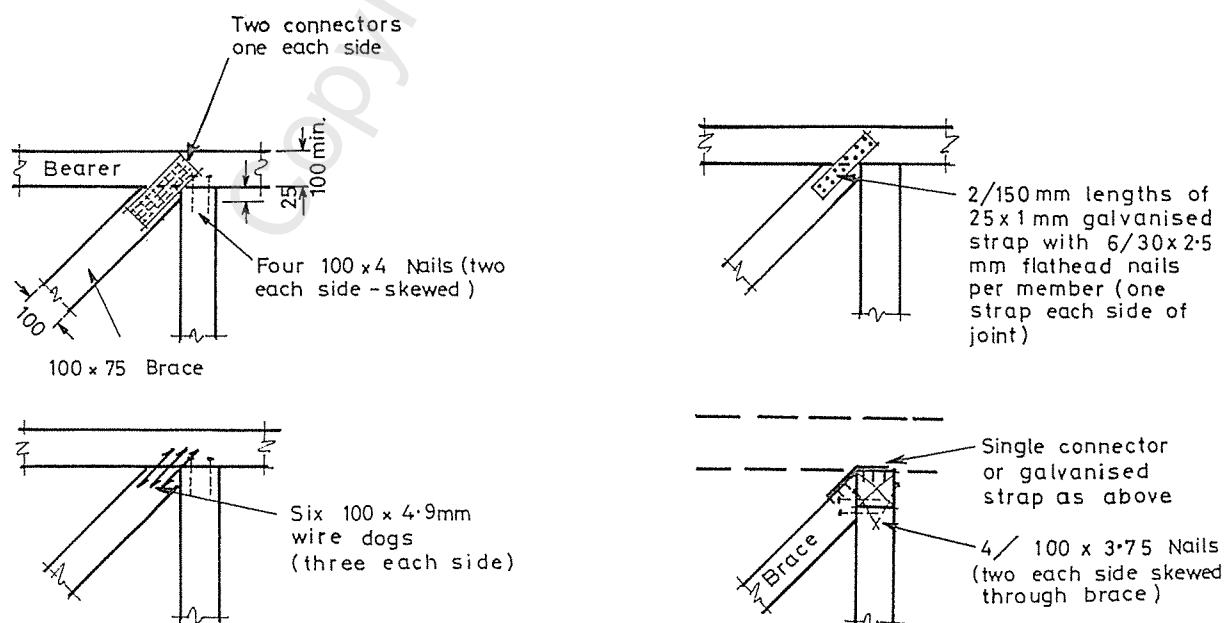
Fixing details for cut-between diagonal timber subfloor braces
